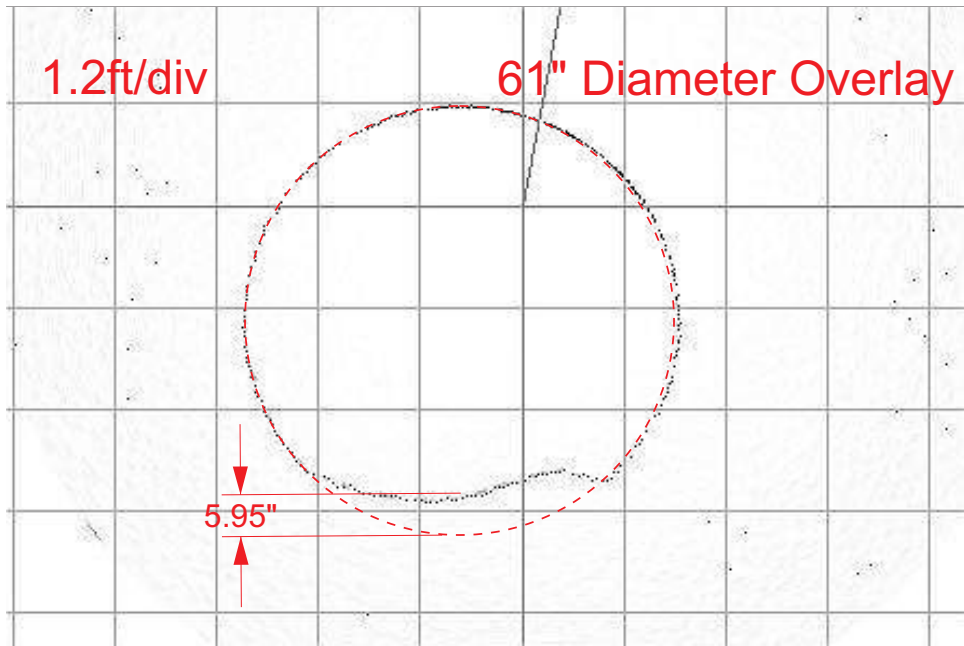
A-17: Sonar Profile 17 - In plant bypass, 9 feet upstream of Manhole 1.
